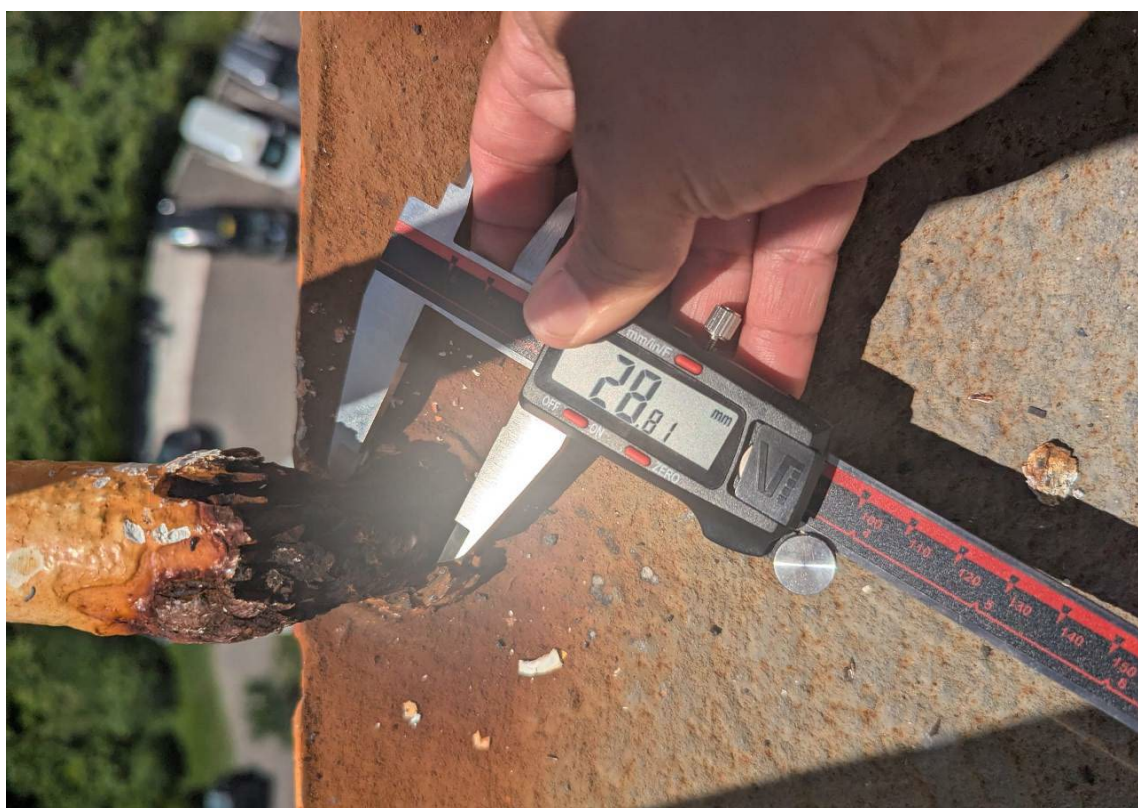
Lower railings connection to platform in Section 7 (Bars 125-130)
